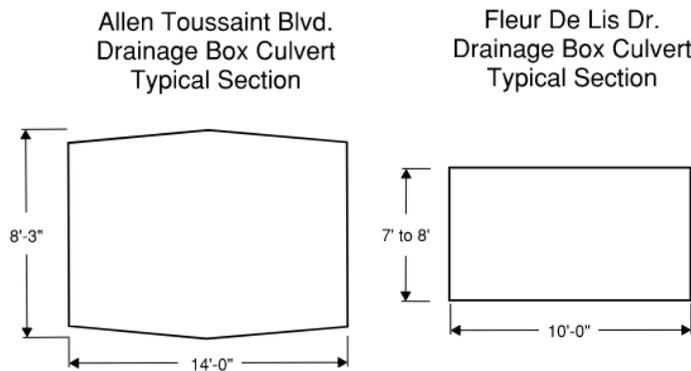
West End Study Area Model (Fleur De Lis Drainage Box Culvert Cross Section)
